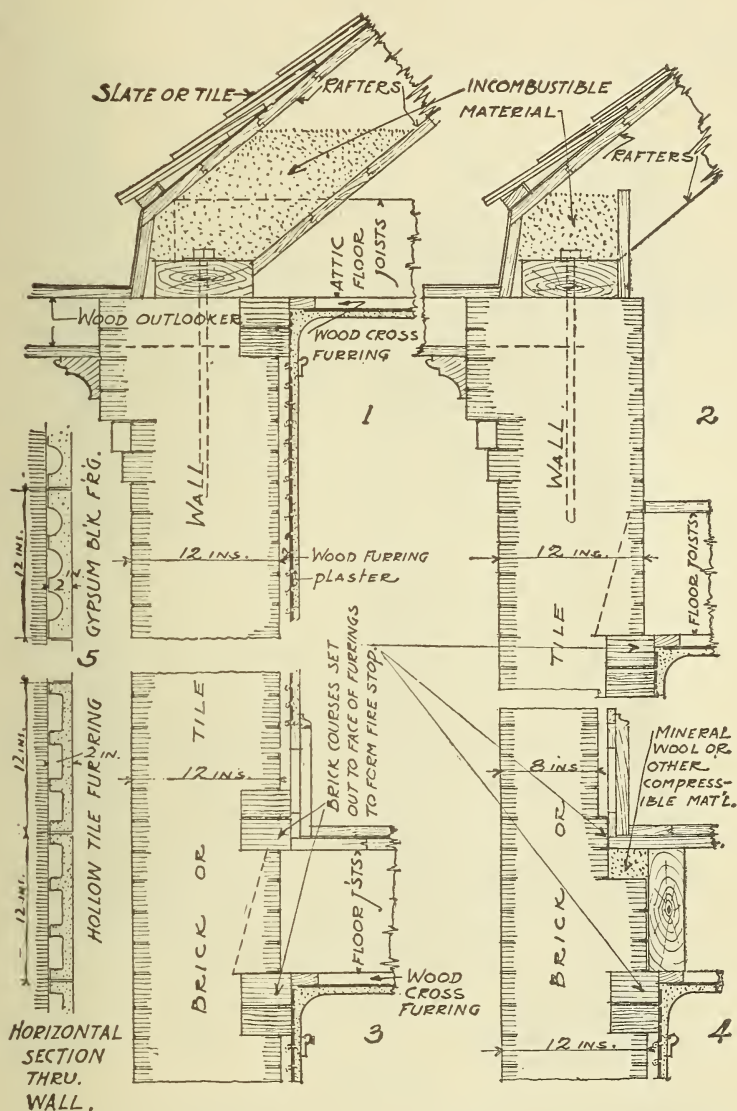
Dwellings with Walls of Brick or Other Masonry
